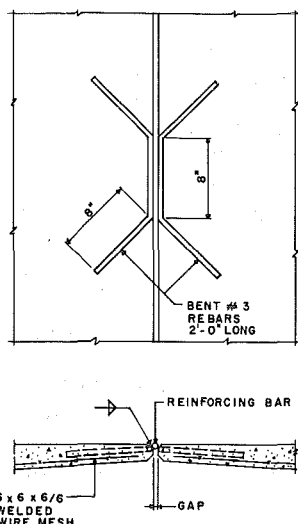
As-Built Tee Connection (1 in. = 25.4 mm)
